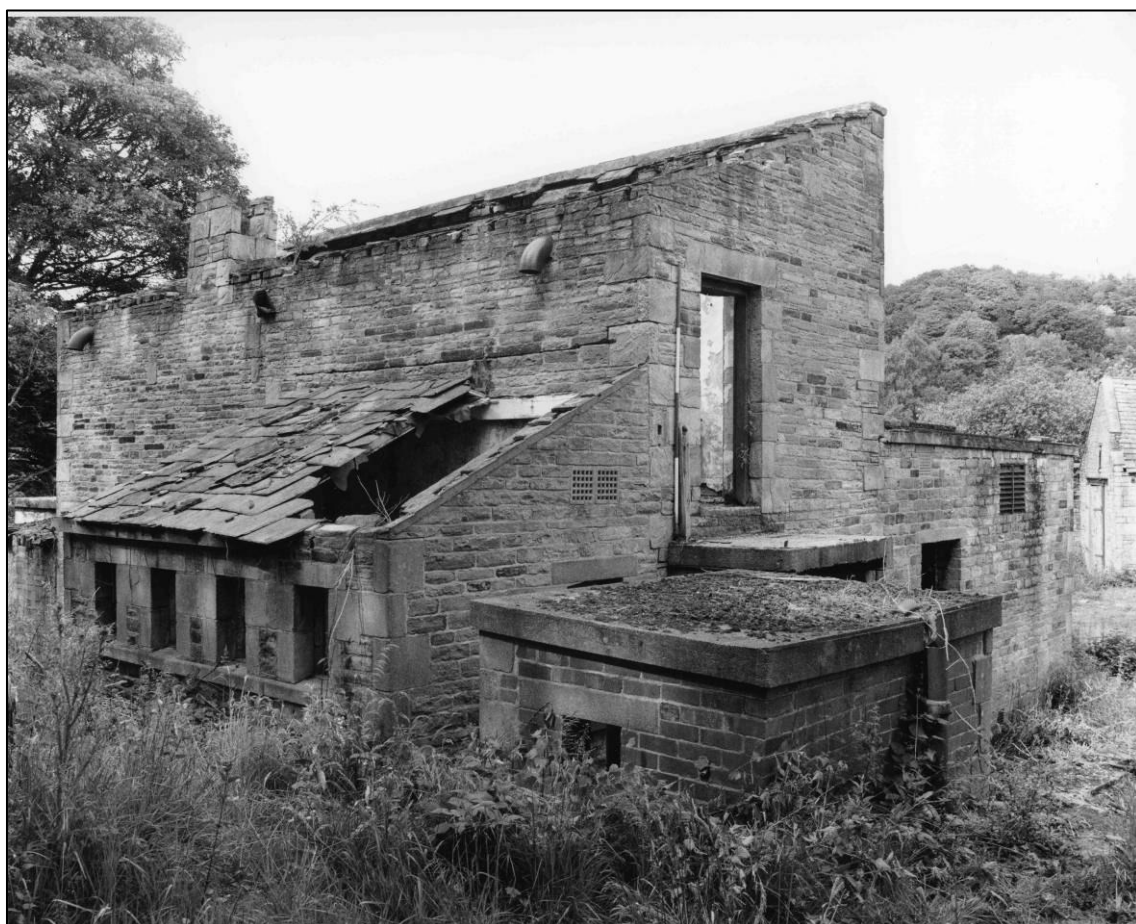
Mine offices (Buildings S1, S5 and S6), looking NW (photo 6/15).
